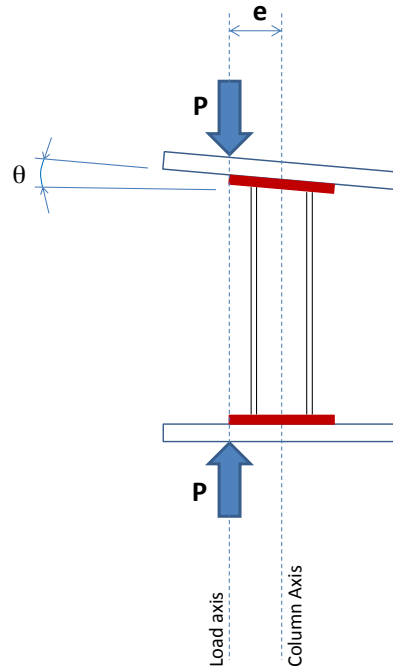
Using loading plate to place the specimen at the desired eccentricity
